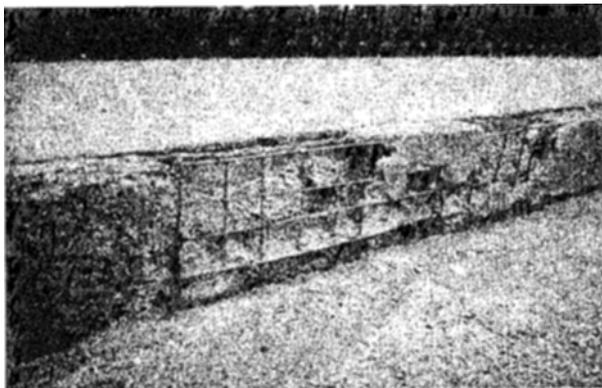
Detail of damaged reinforced concrete parapet in the splash zone
